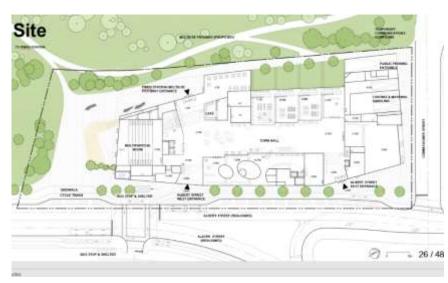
General site plan showing circulation systems outside the building in relation to the main floor and hall. Source: NCC, May 2019.
